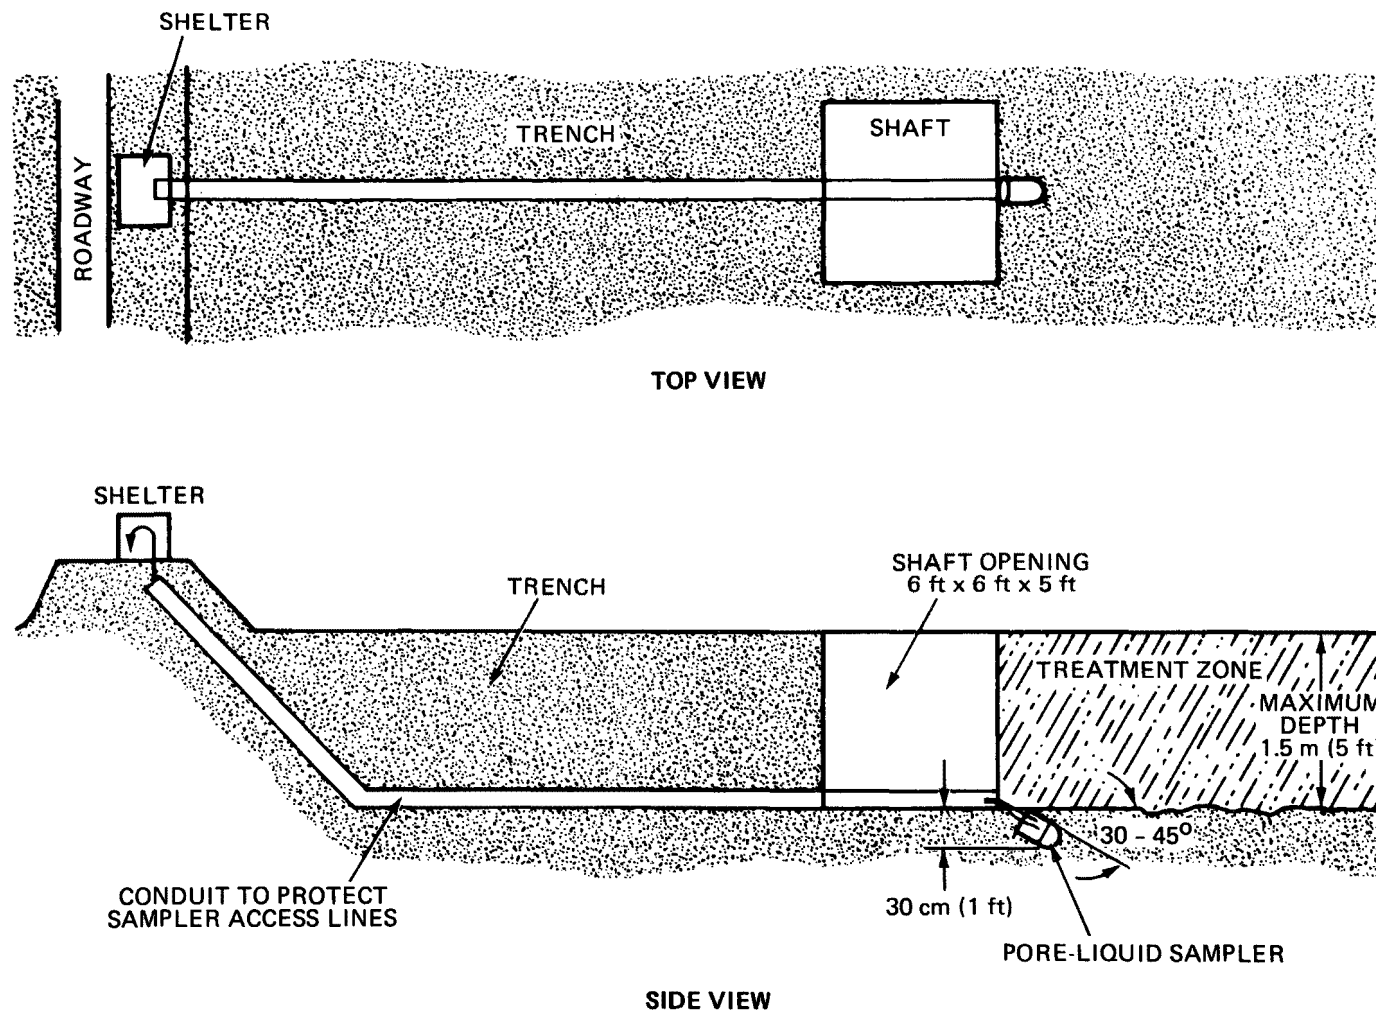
Views of trench and access shafts at pore-liquid sampler sites on active land treatment site
